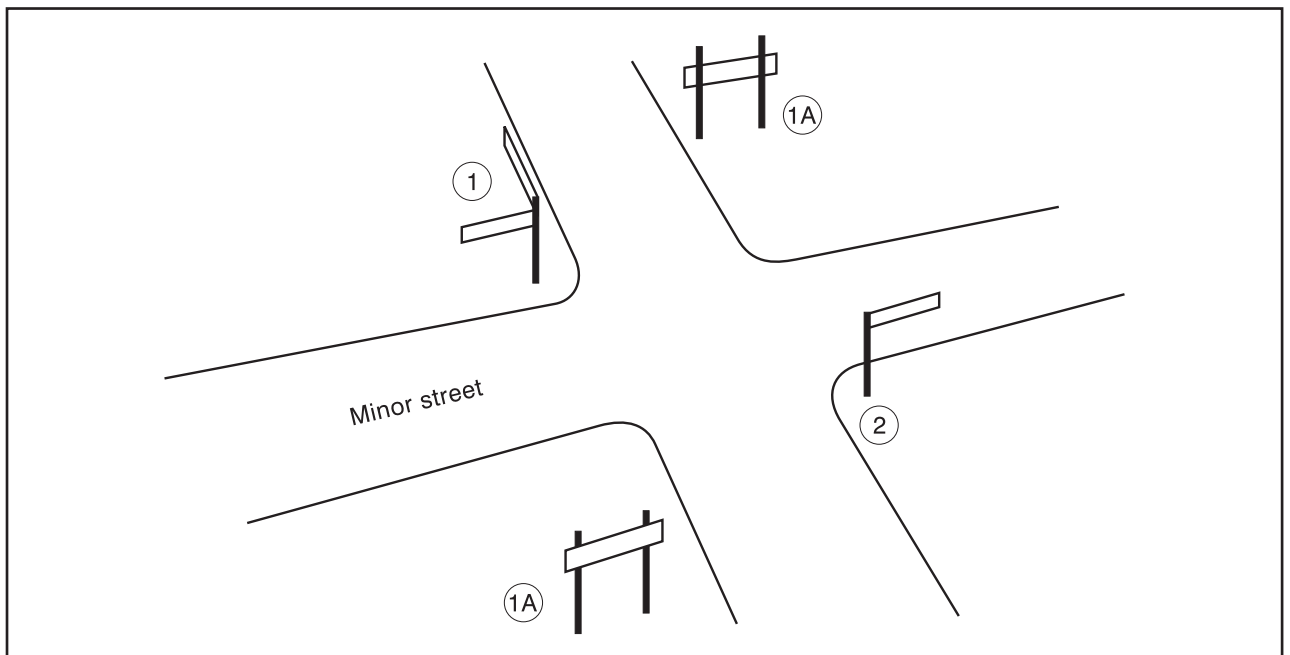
INTERSECTION OF MINOR STREET WITH UNDIVIDED MAJOR STREET
